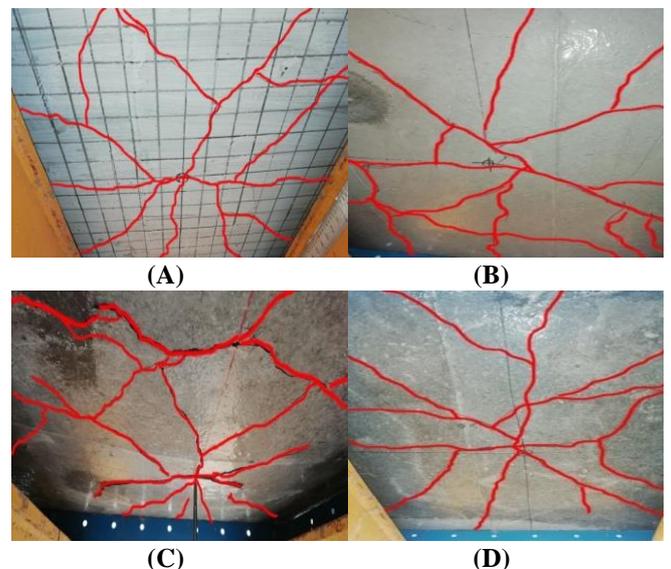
Final punching shear failure surface for tested specimens of Crack patterns (A) Slab1; (B) Slab 2; (C) Slab3 ;(D) Slab4 (images by author)
